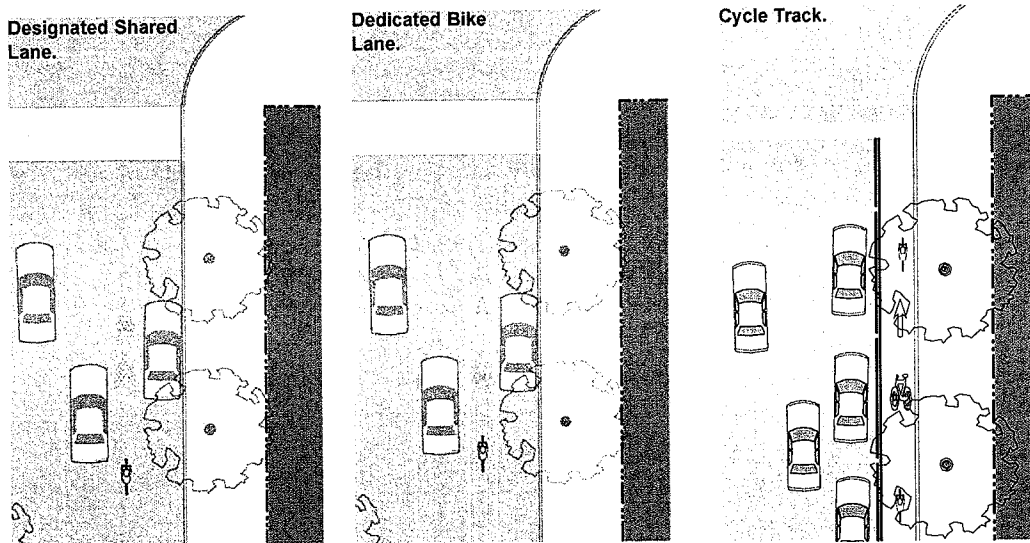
(b)-2: On-Street Bicycle Facilities.
